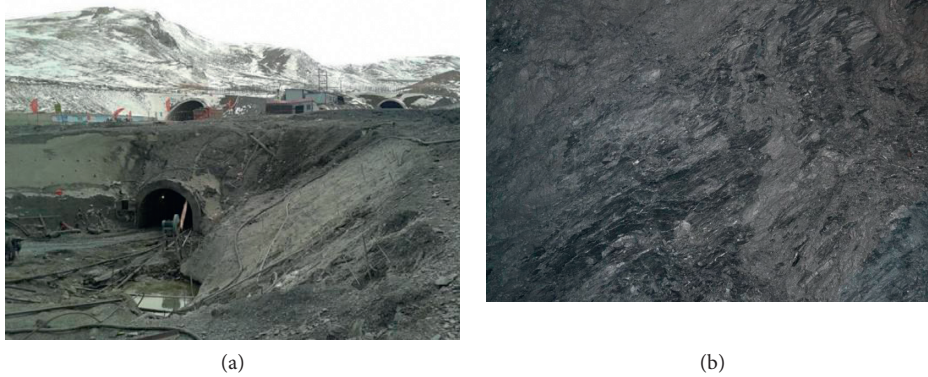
Jiangluling Tunnel. (a) Cross section of the tunnel entrance. (b) Photo of the surrounding rock at tunnel entrance face.
